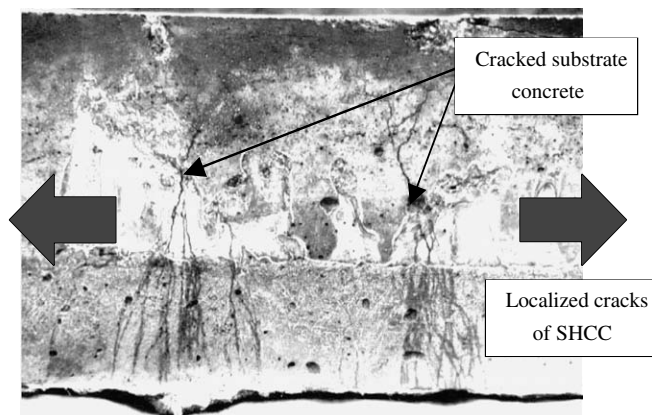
Limited crack distribution of SHCC near to existing cracks of substrate concrete.
